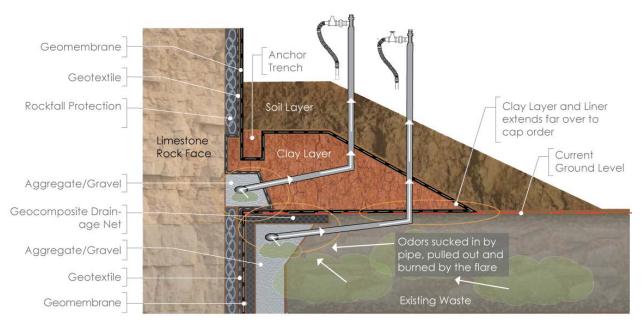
Conceptual Cross Section of the Sidewall Odor Mitigation System
